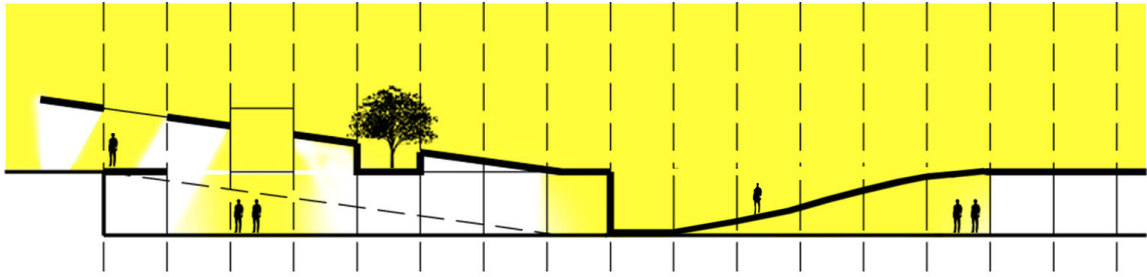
Retail section / outdoor-indoor areas/ access to daylight / blocks configurations
